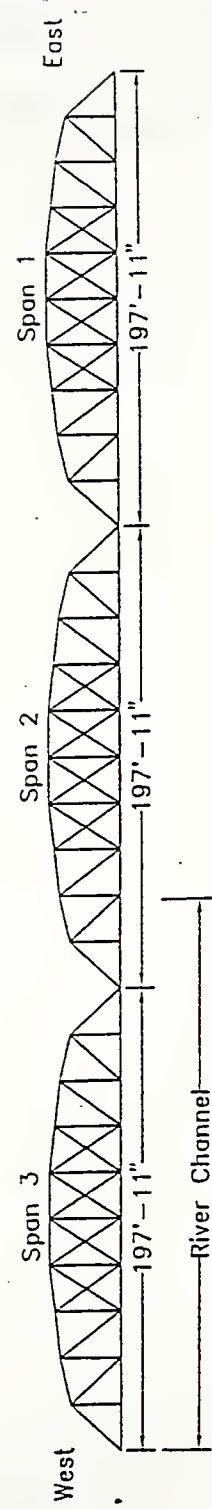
Bridge Structure No. 58-14-3244
